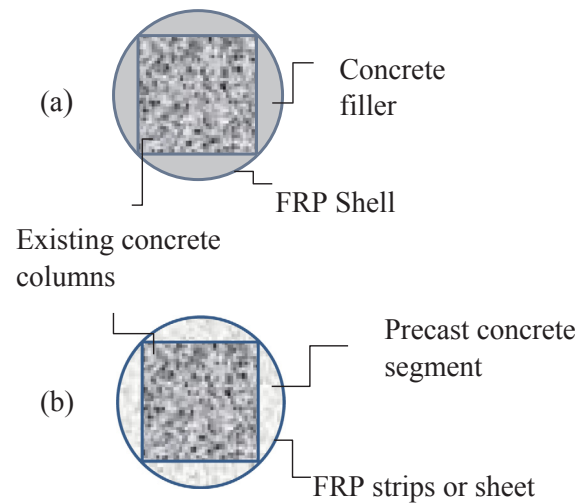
Modification methods of non-circular sections (a) using prefabricated FRP shell and (b) using precast concrete segment.
